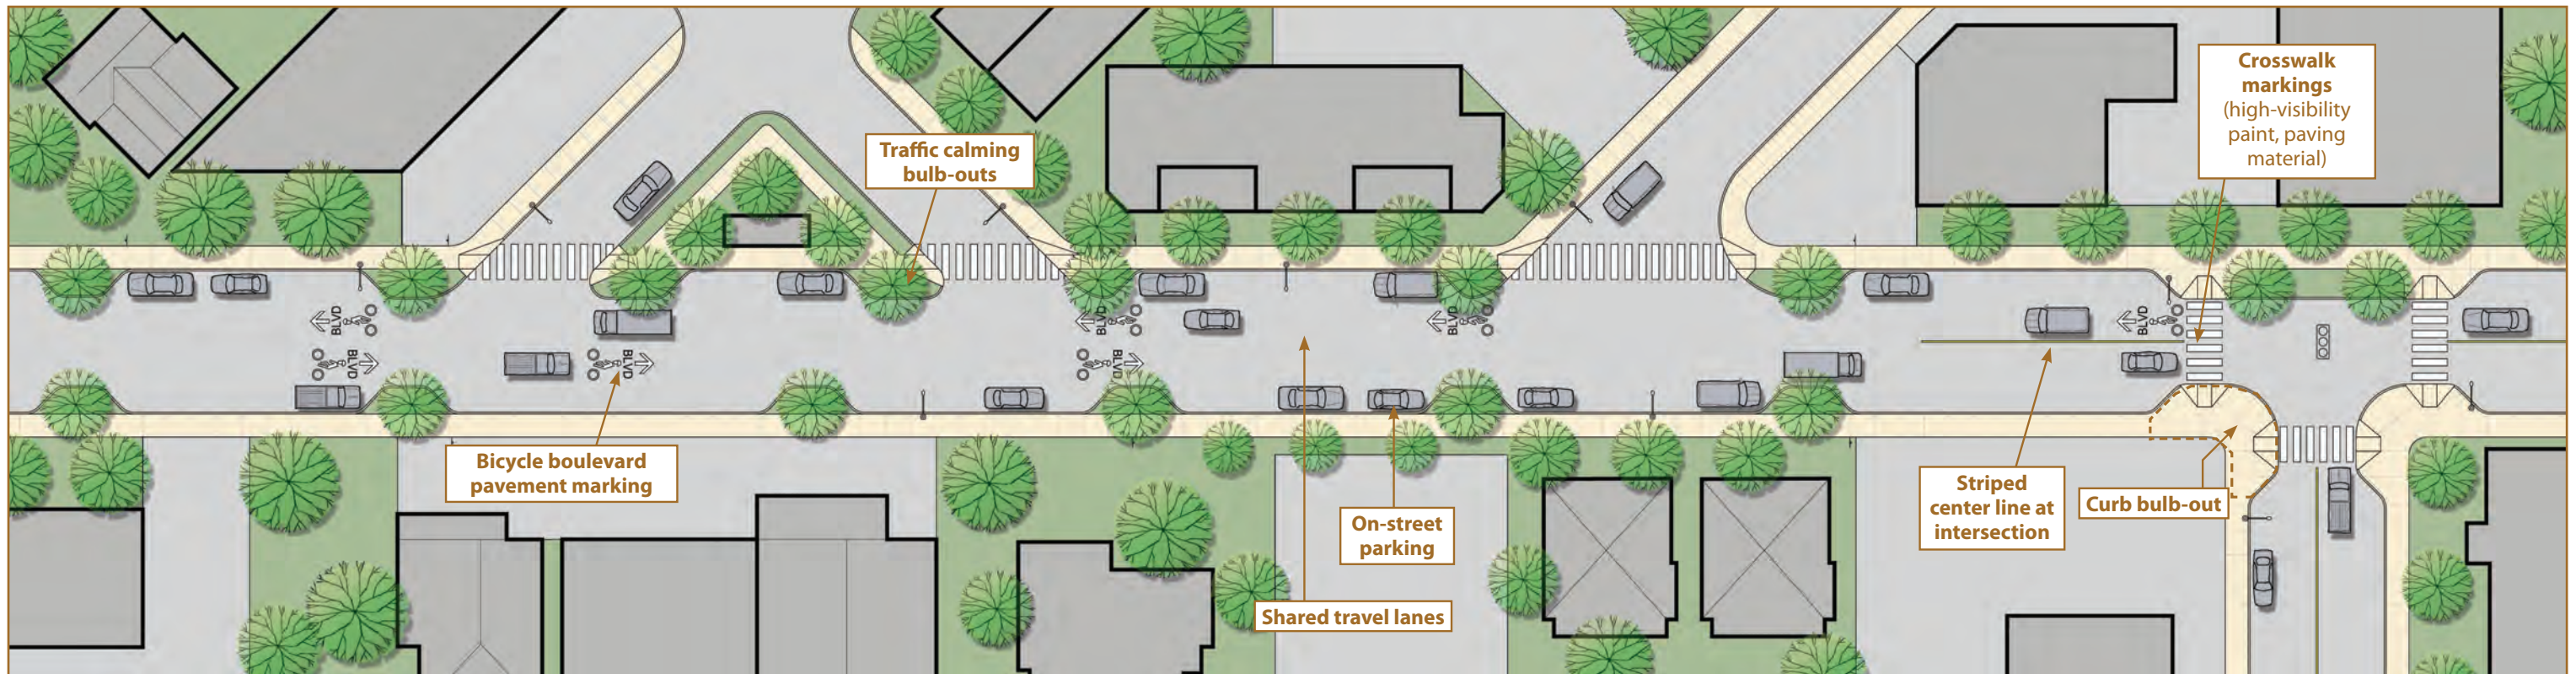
Bicycle Boulevard on Downtown Essential Streets
